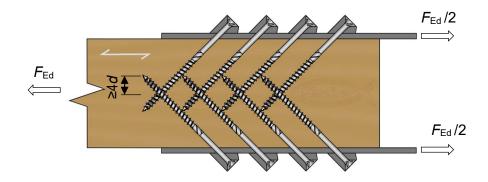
Shear connection with inclined screws steel-to-timber connection (figure not to scale)
